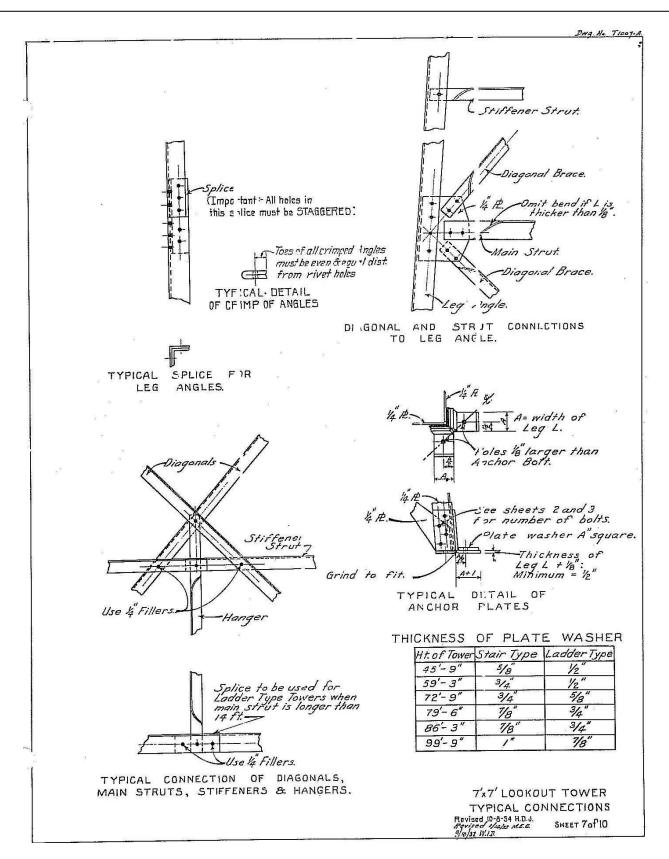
USFS specifications for steel fire lookout tower bracing connections (Fickes, 1935: 305).
